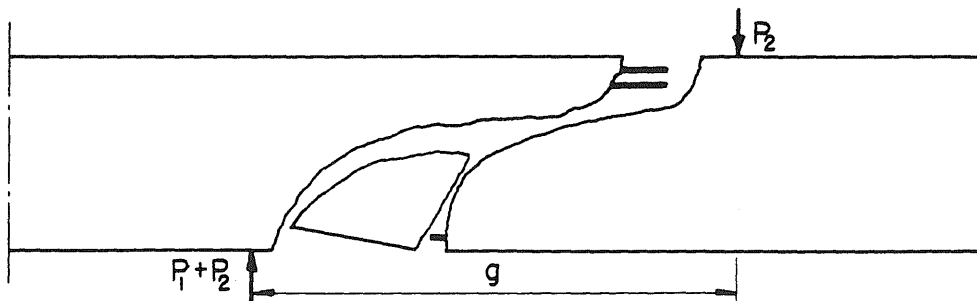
STRIPPING TYPE OF BOND FAILURE RESTRAINED BEAMS
